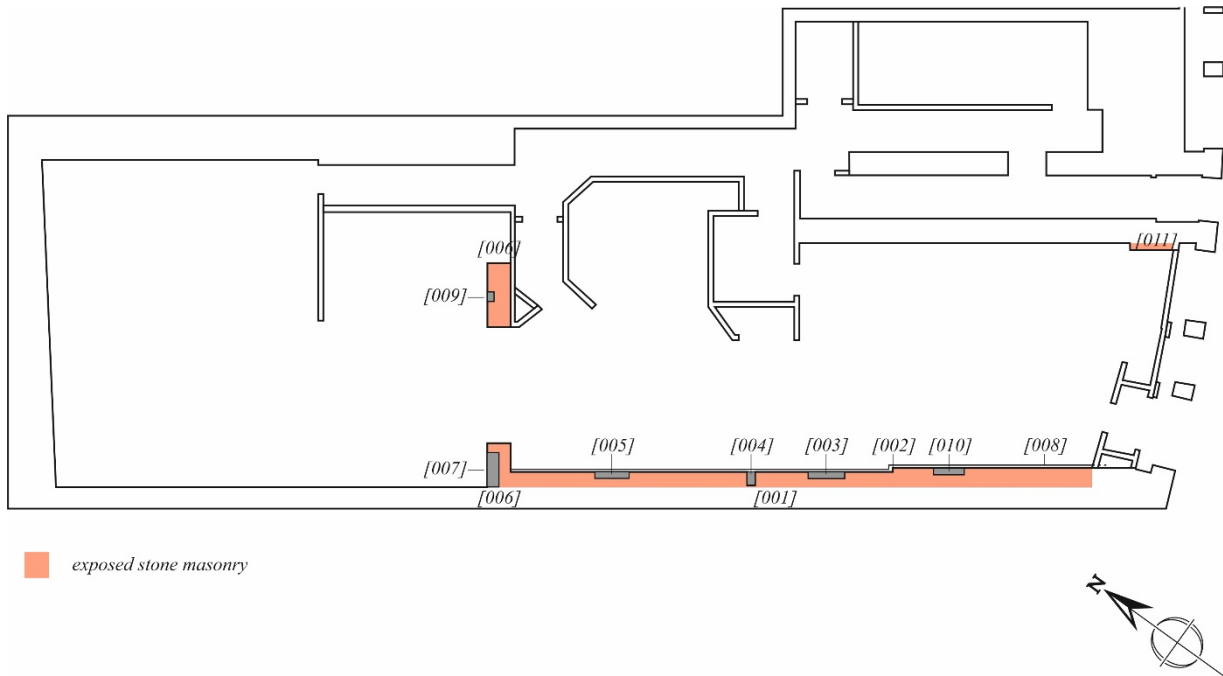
Site Plan showing the Exposed Stone Masonry Walls and Features.
